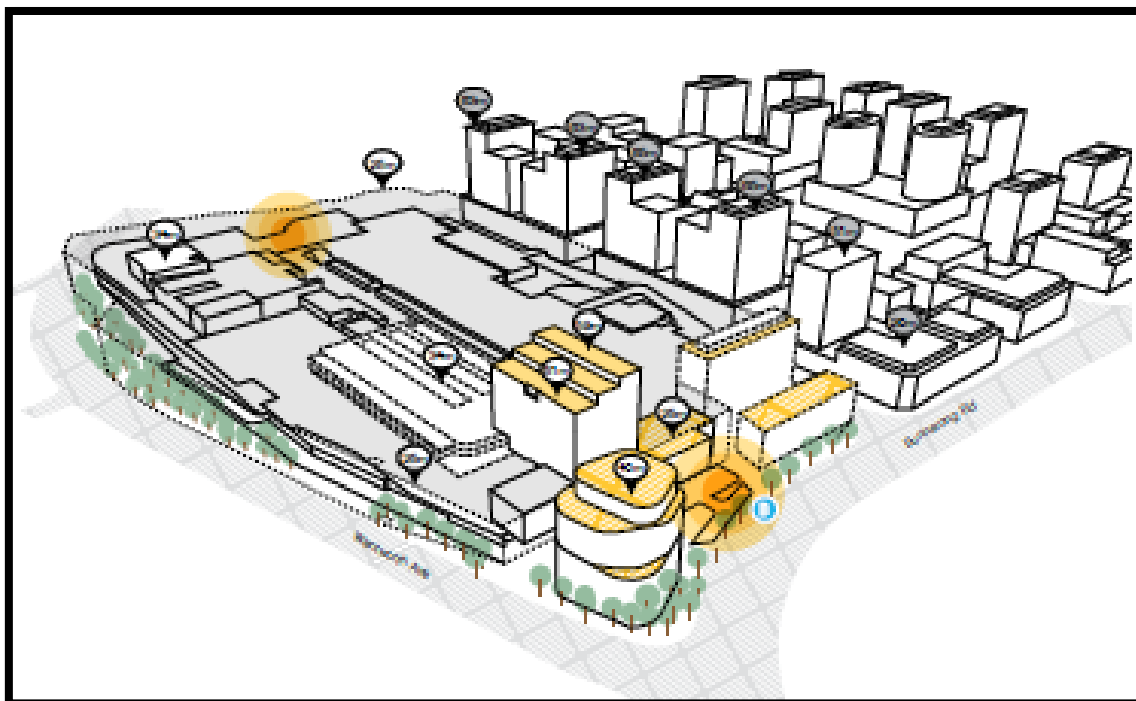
Master Plan – Key Features (Source: Architectus)
